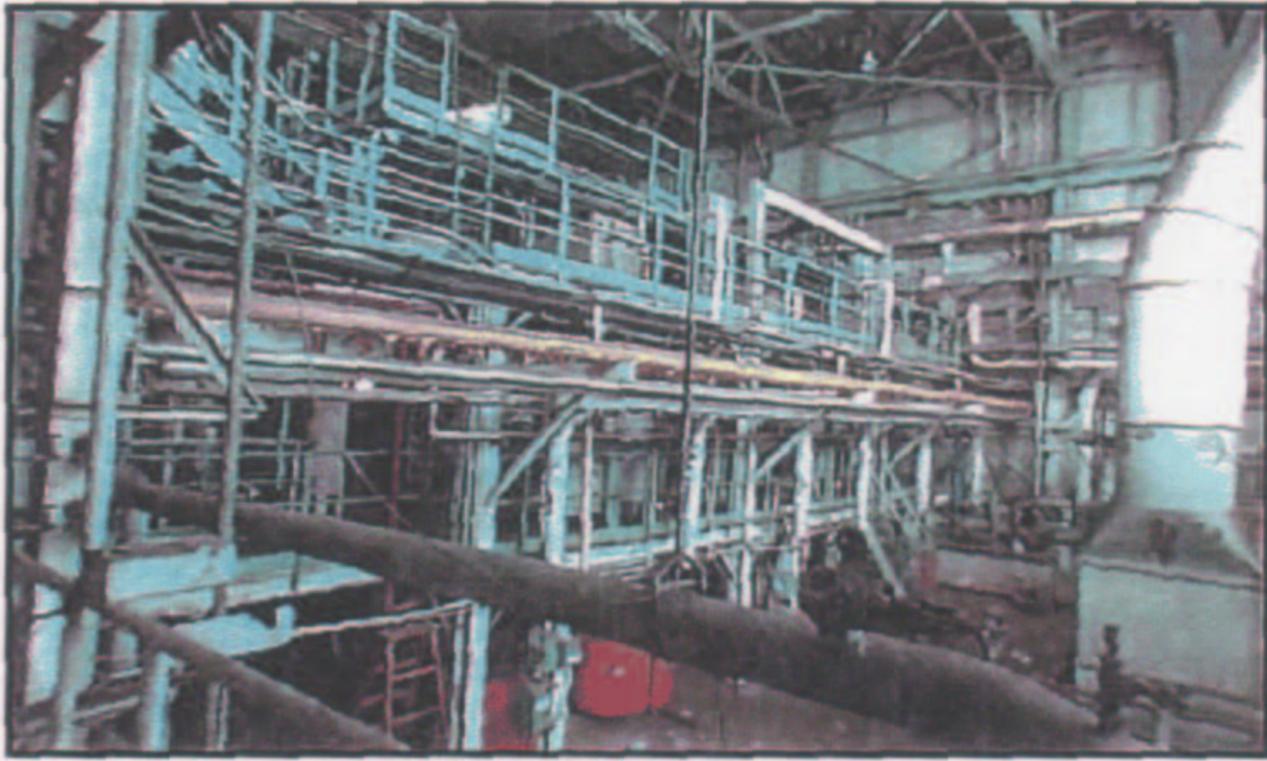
Refrigeration Area located on the 1st floor of C-410.
